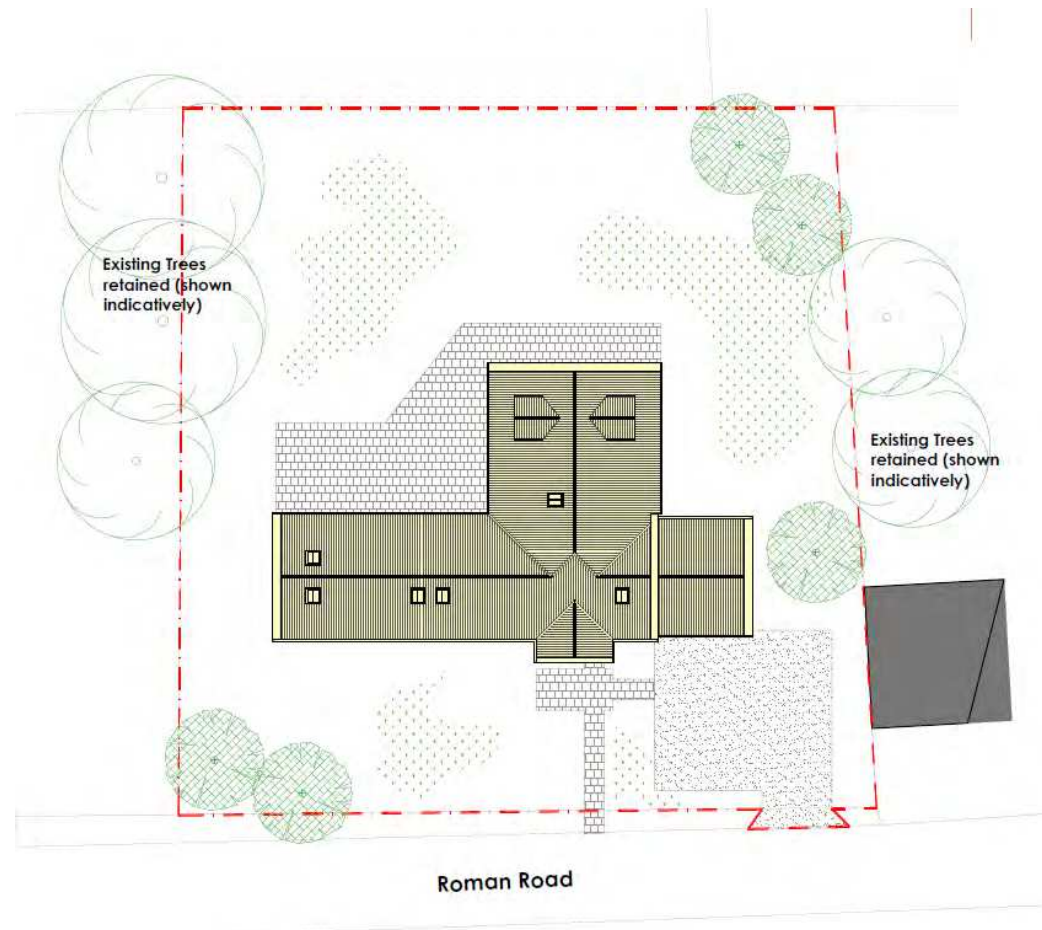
Extract from 23023-D01 Site Plan (Source: D2 Architectural Design).
